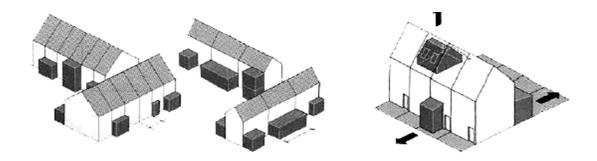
Horizontal and vertical extensions to buildings. Source: Schneider and Till (2007).
